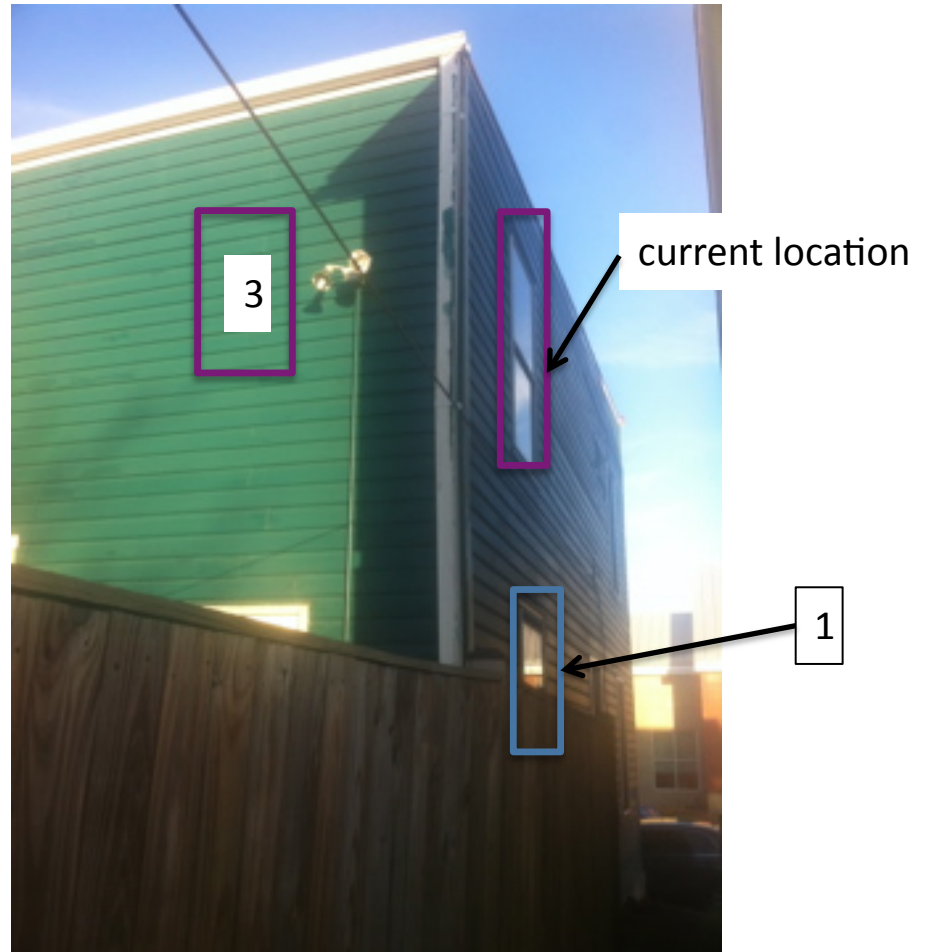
708 N Patrick St. side (south facing) and rear elevation (west facing)
